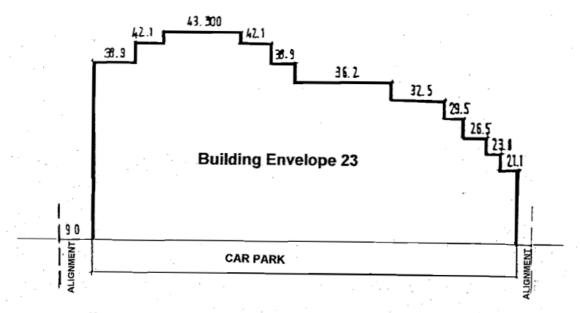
(d) SECTION 1 BUILDING ENVELOPE 23
